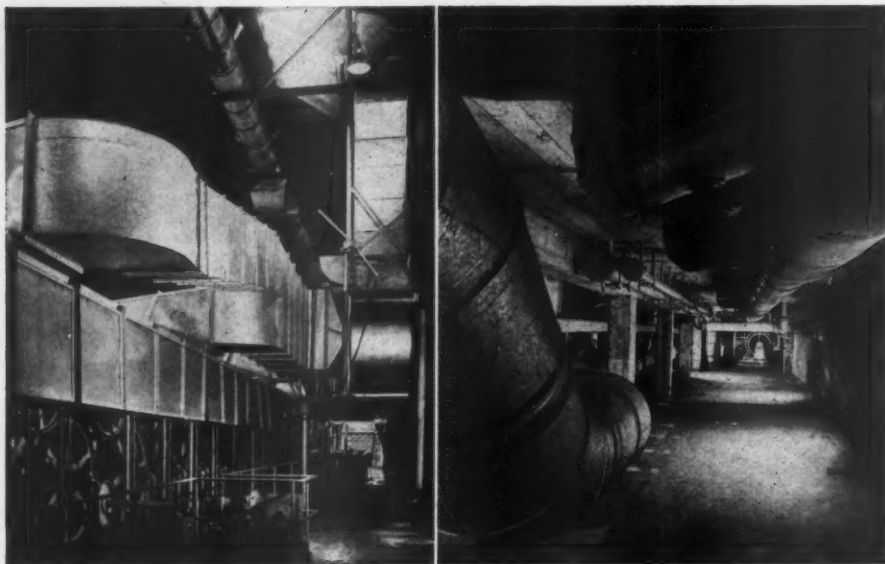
PHOTO AT LEFT shows—Machine room; dryer drive side with air exhaust system. Section of roof ventilation system is above. Each sectional drive unit consists of motor, reducer, differential gearbox and control. SKF bearings are used.
